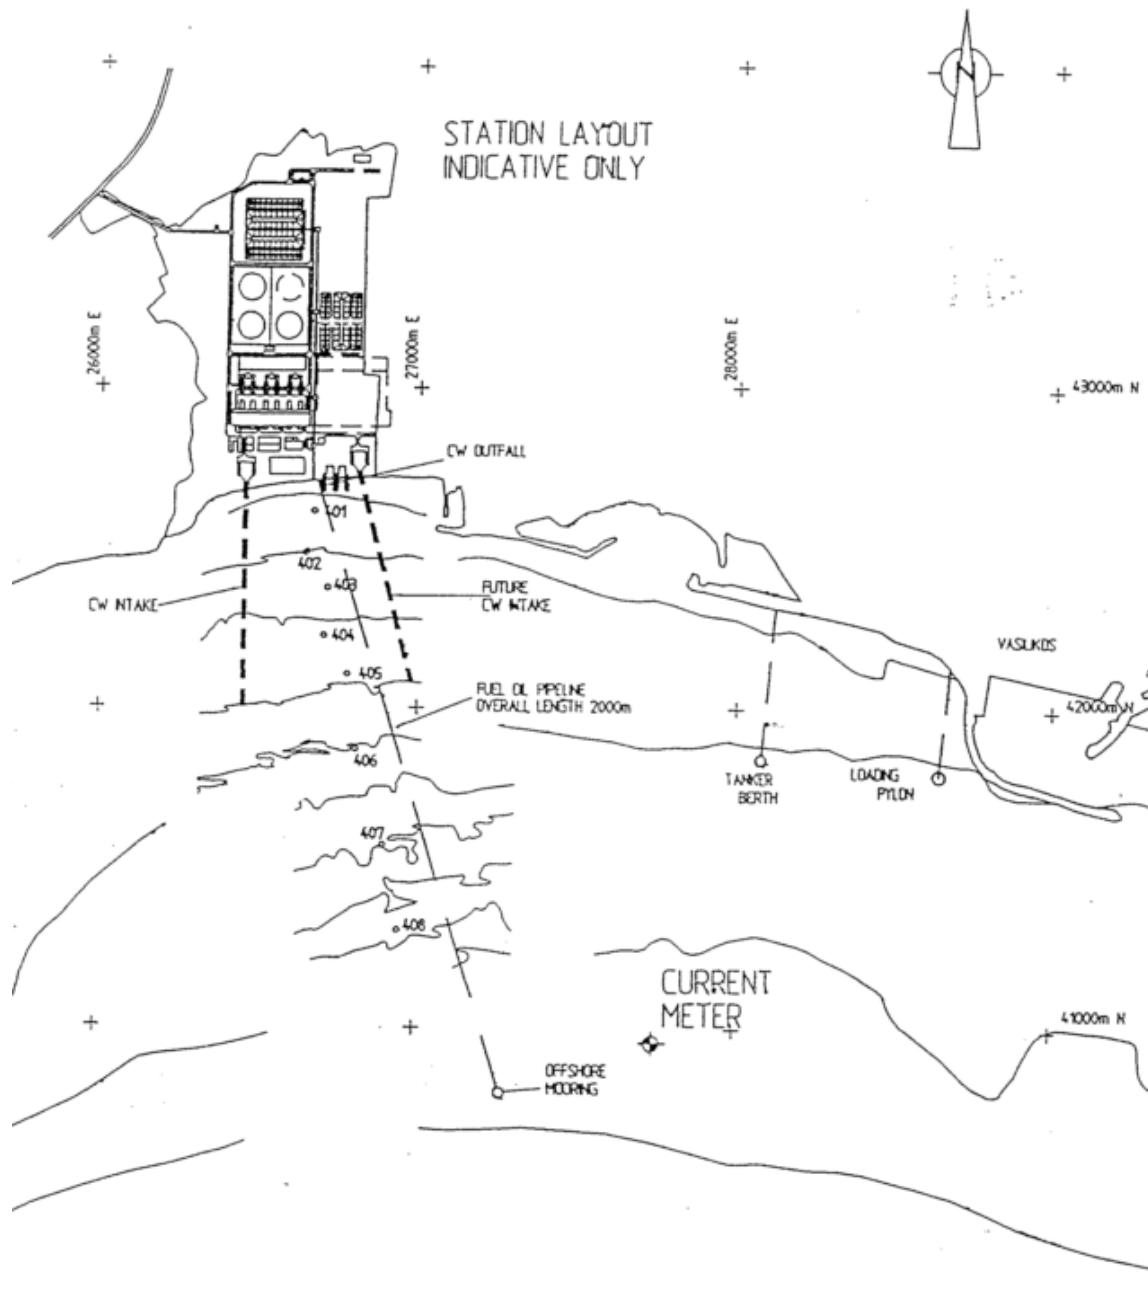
Layout of Vasilikos power plant near gas loading/unloading locations
